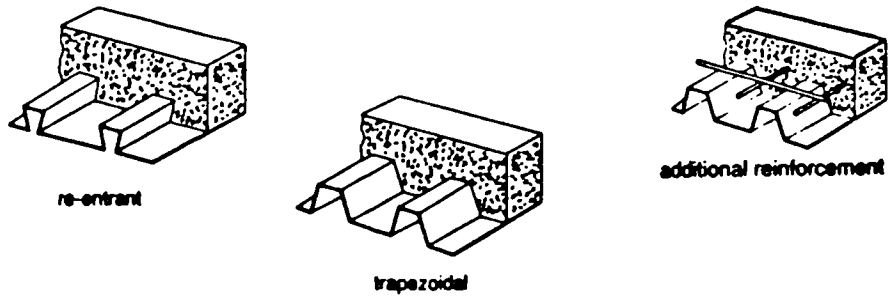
Typical composite concrete/steel deck slabs [8.2]
